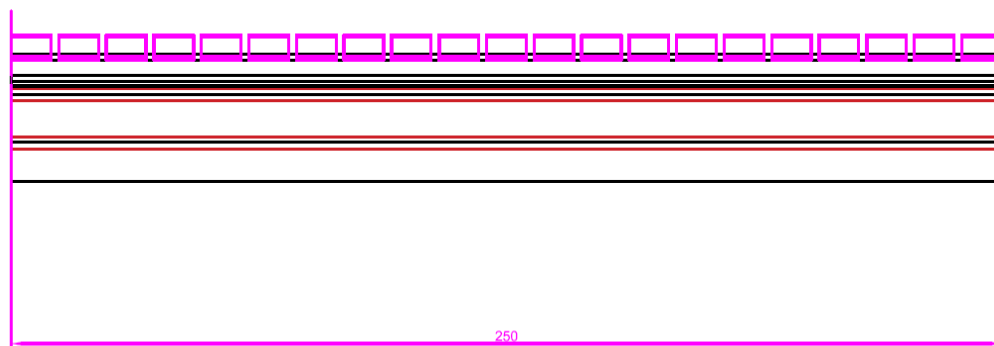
15 Longitudinal Section of the Quarter Bridge scale of 1:50
